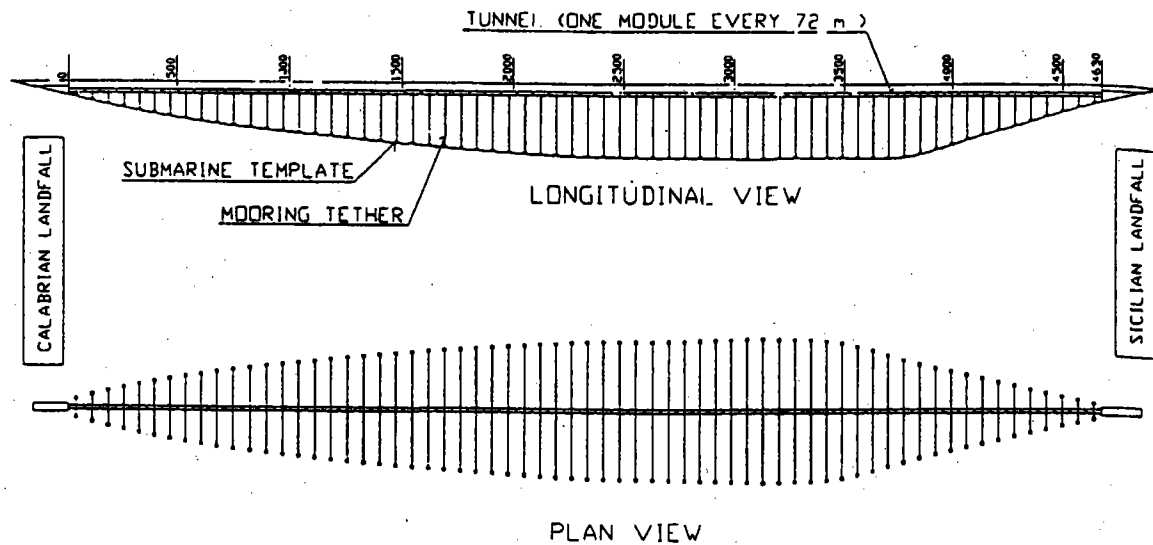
RAILWAY TUNNEL CROSSING - GENERAL LAYOUT
